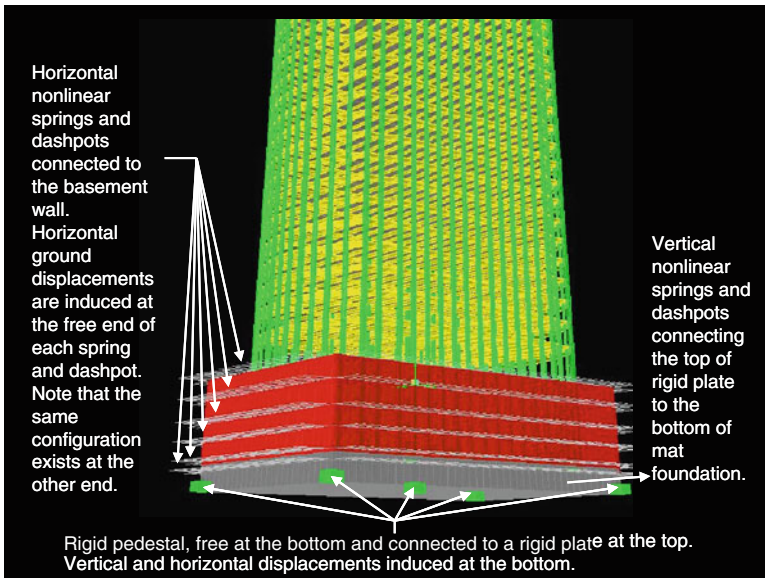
A soil-foundation-structure interaction modeling technique for tall buildings with subterranean floors
